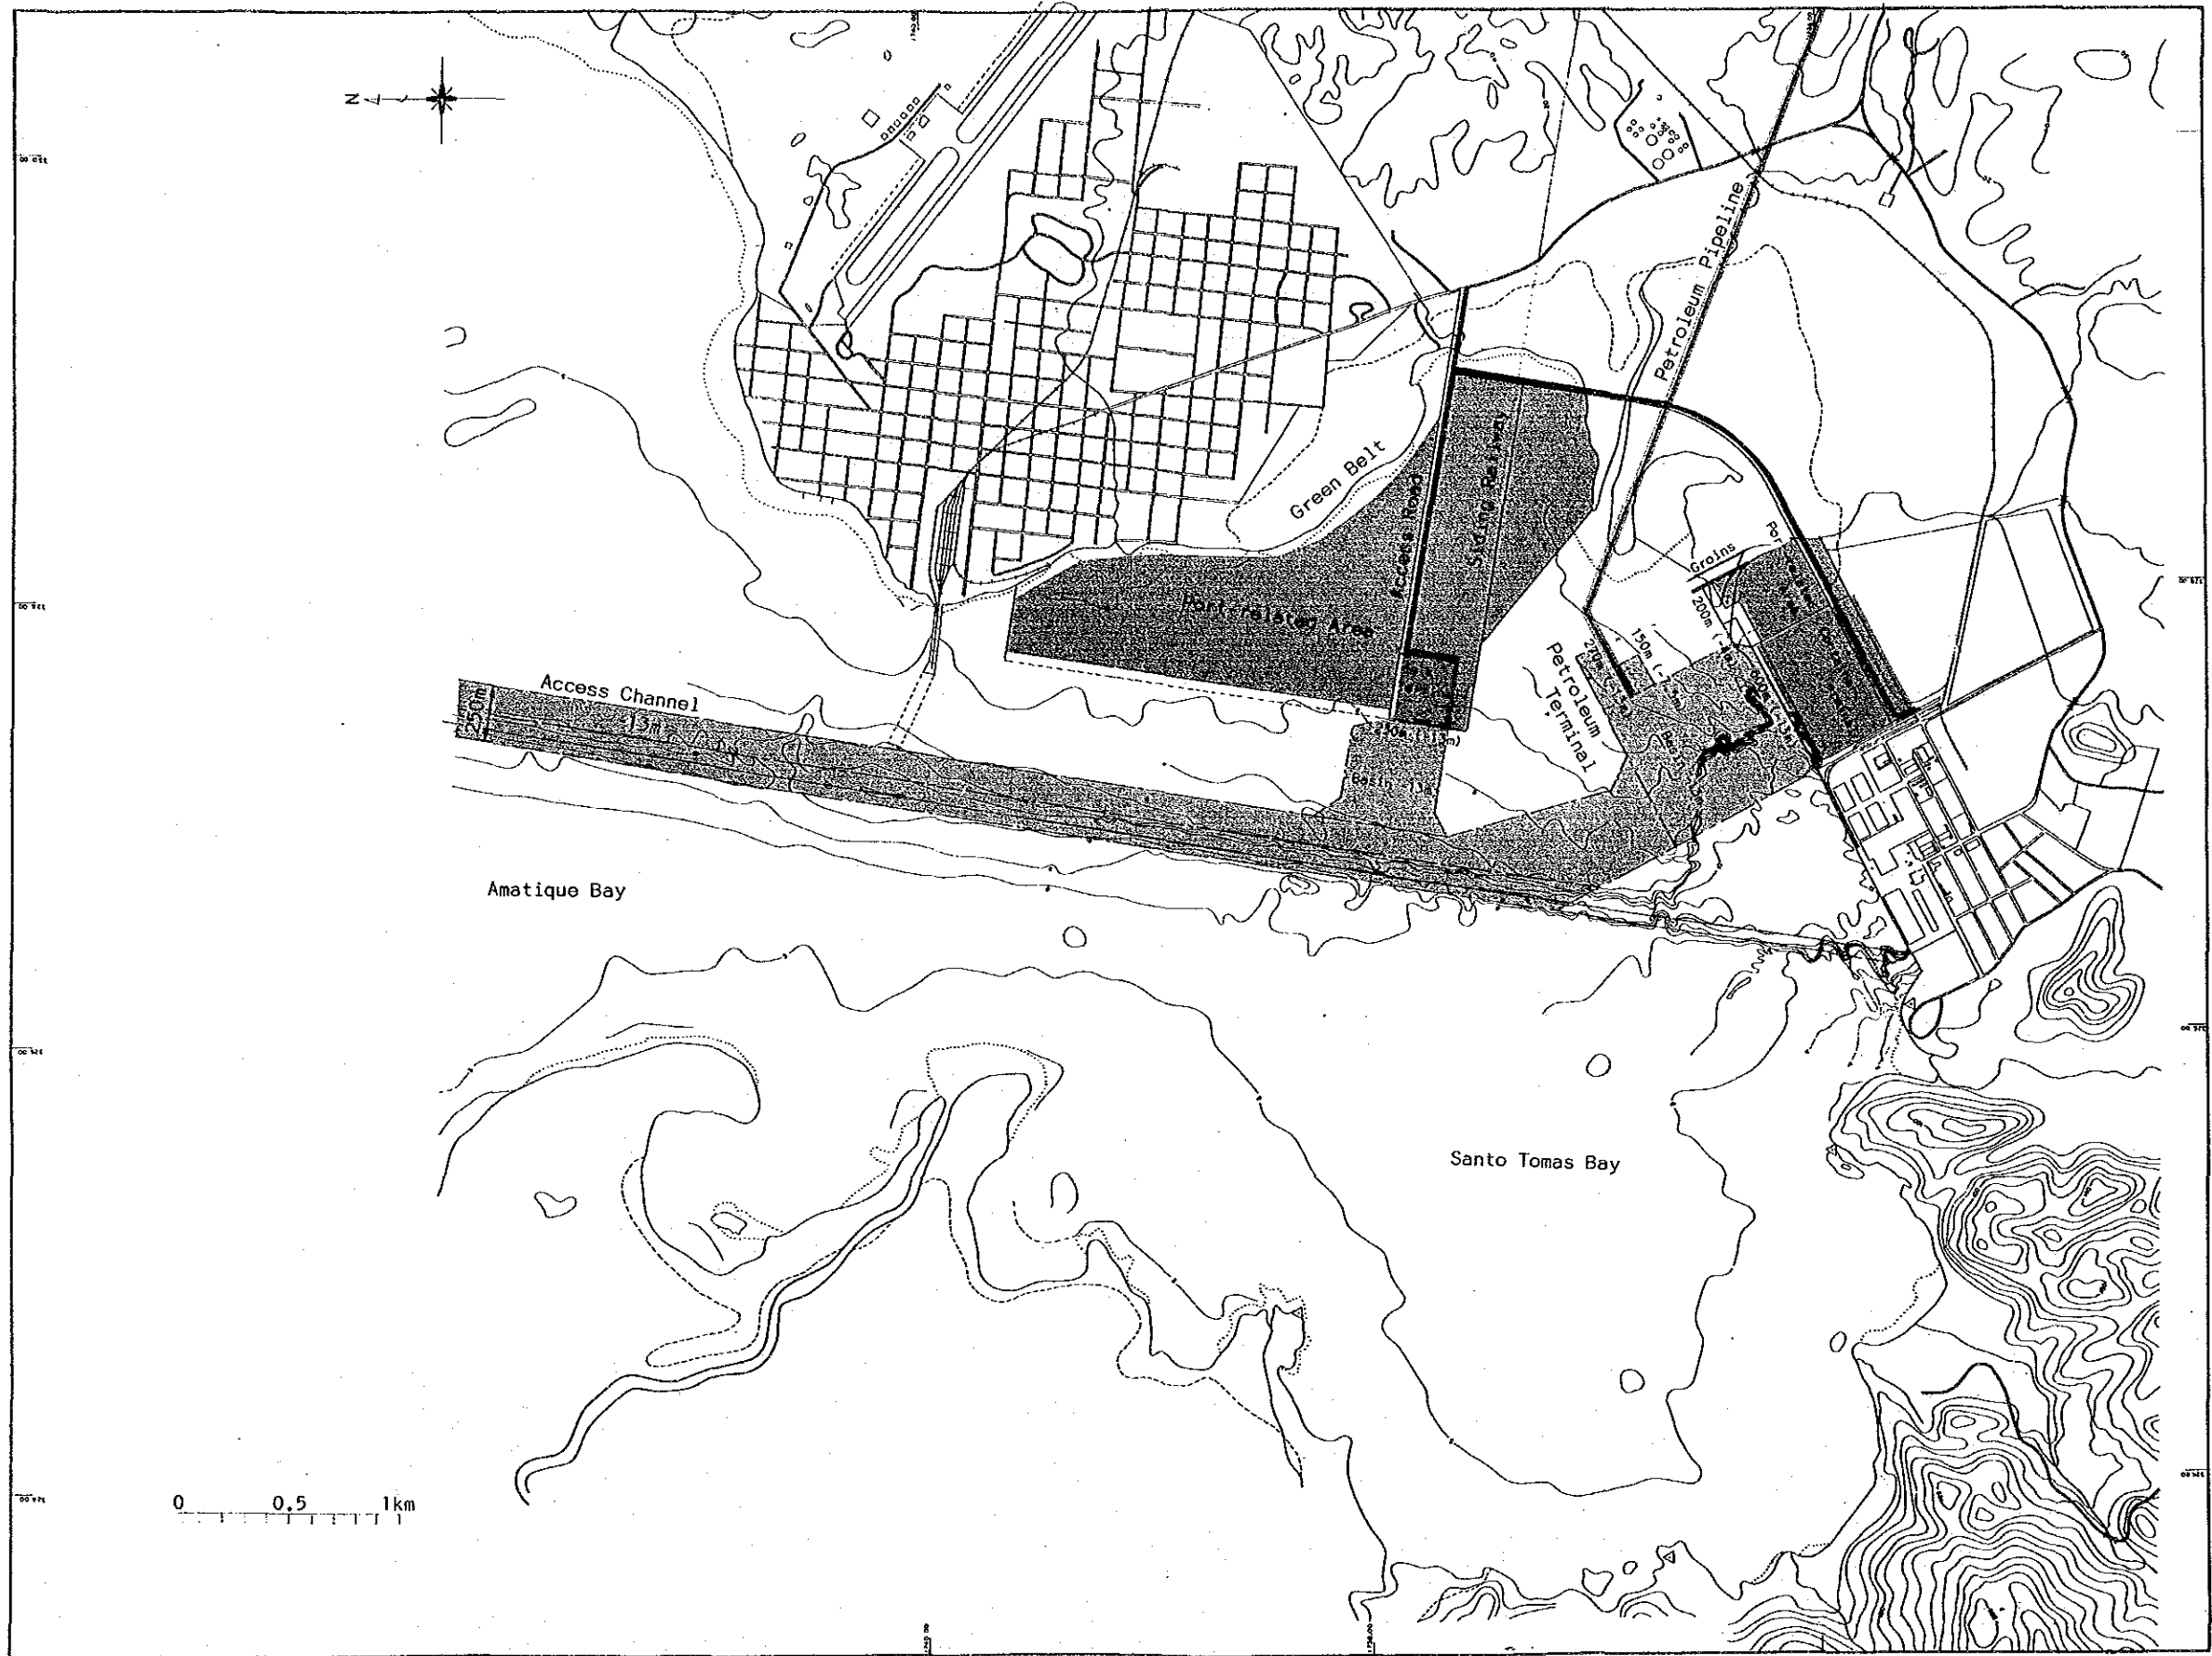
Alternative Layout Plan -- Case 1
